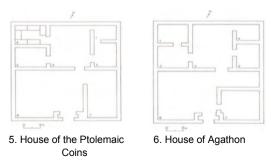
Ground plan of excavated houses (Reinders and Prummel 2003).
